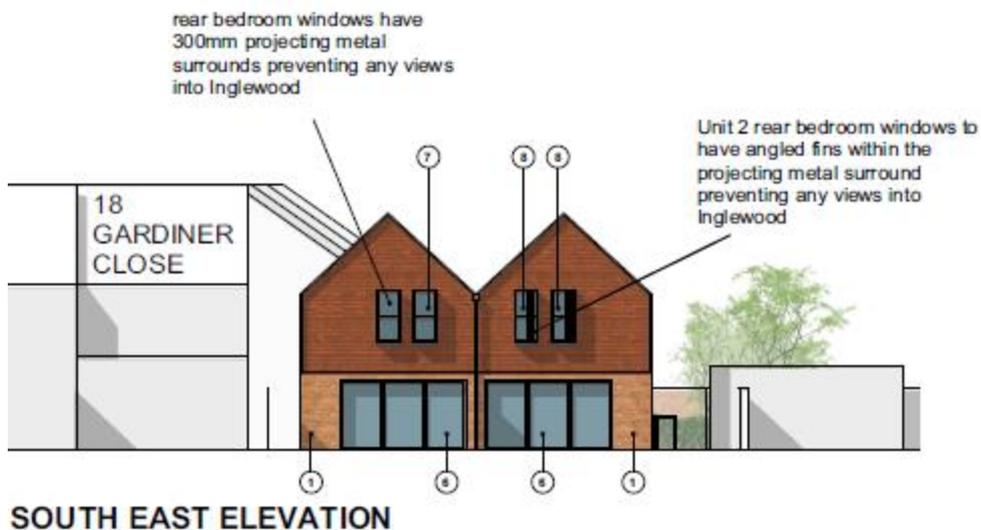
Rear elevation of current scheme (ref.22/00192/FULL1):
